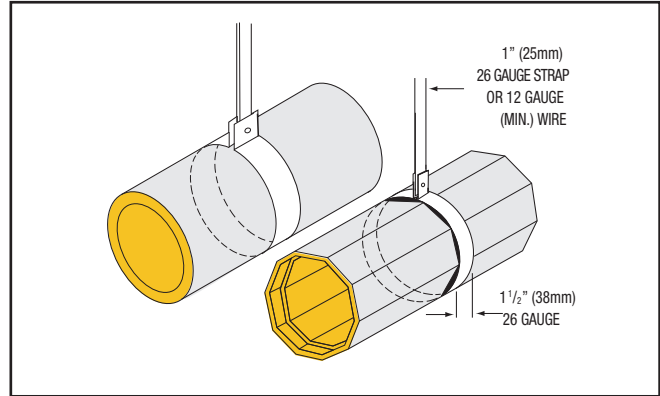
B. Hanging Ten-Sided and Preformed Round Fibrous Glass Duct With Saddles and Sheet Metal Straps
